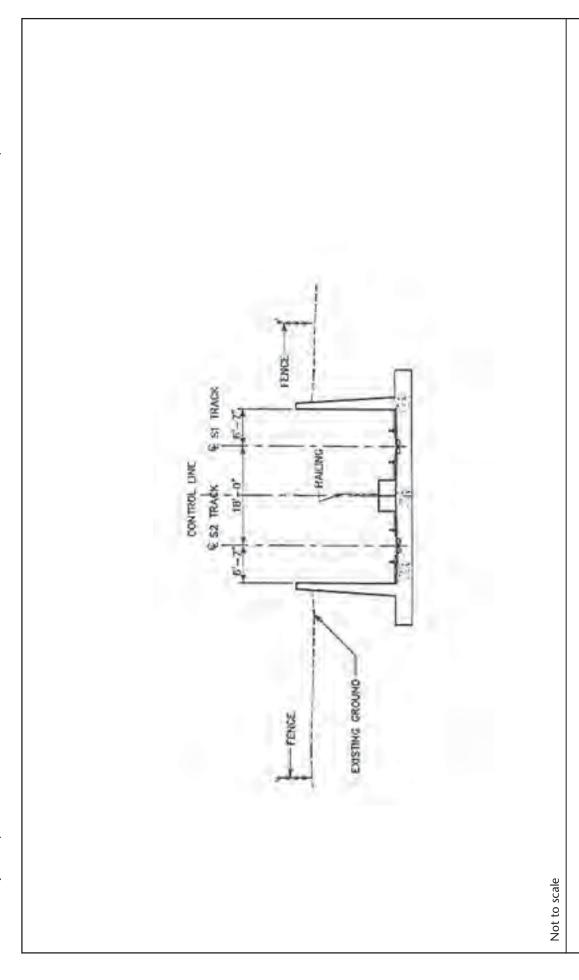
BART Subway Portal (Transition Structure) – Typical Section
